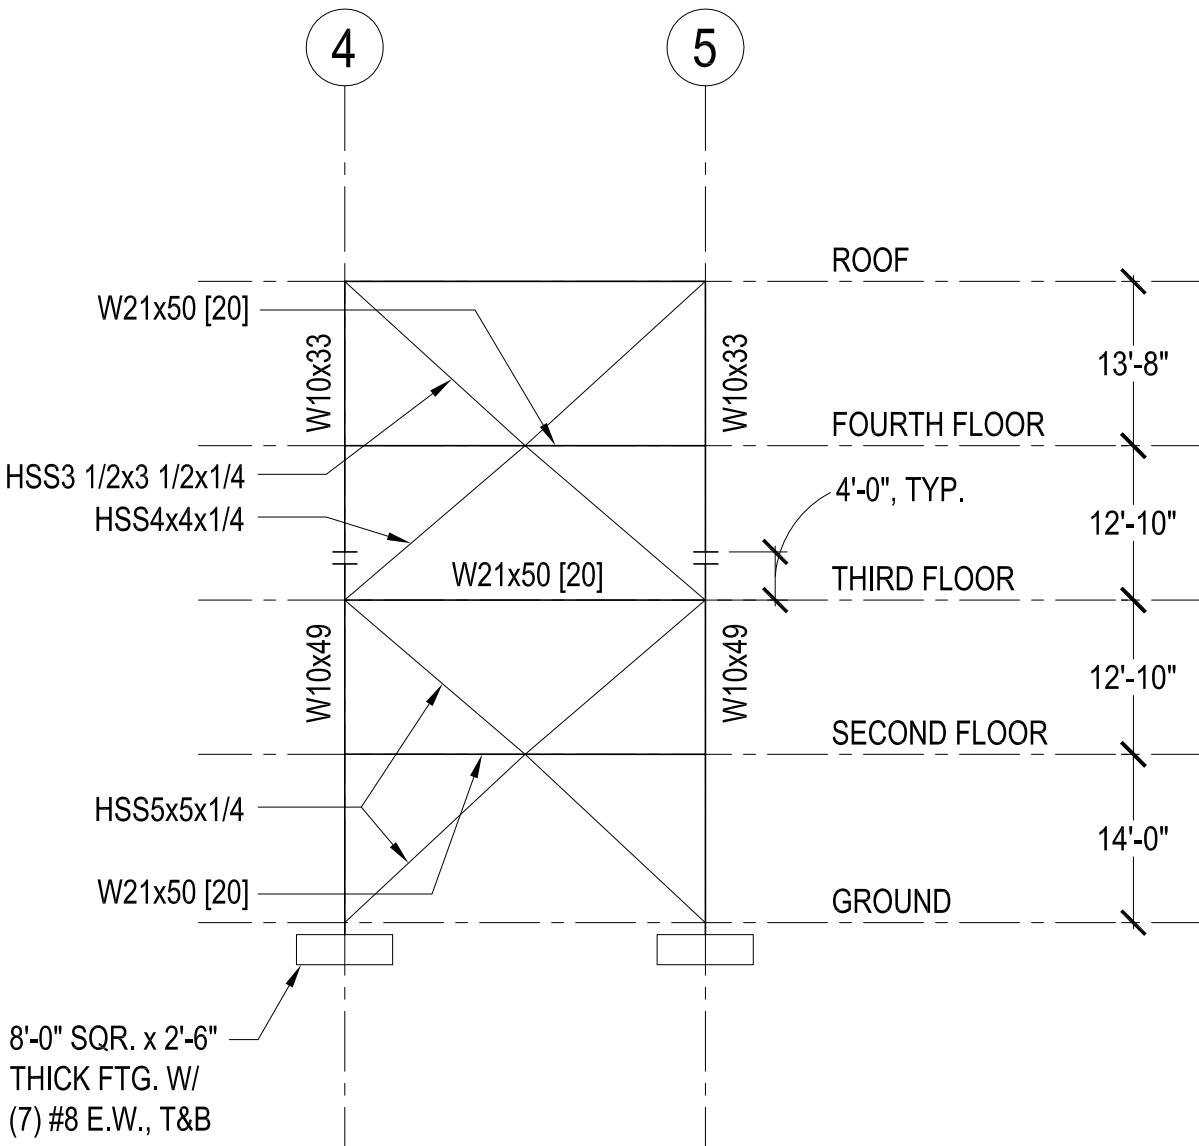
BRACED FRAME ELEVATION (N-S DIRECTION)
